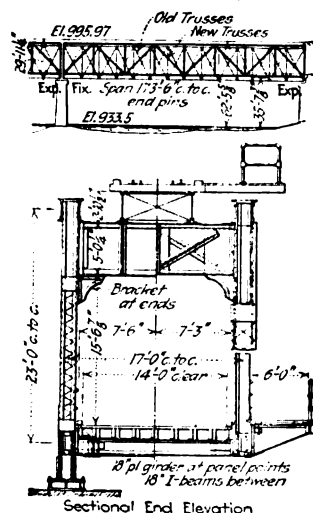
CROSS-SECTION OF NEW FOXBURG BRIDGE
